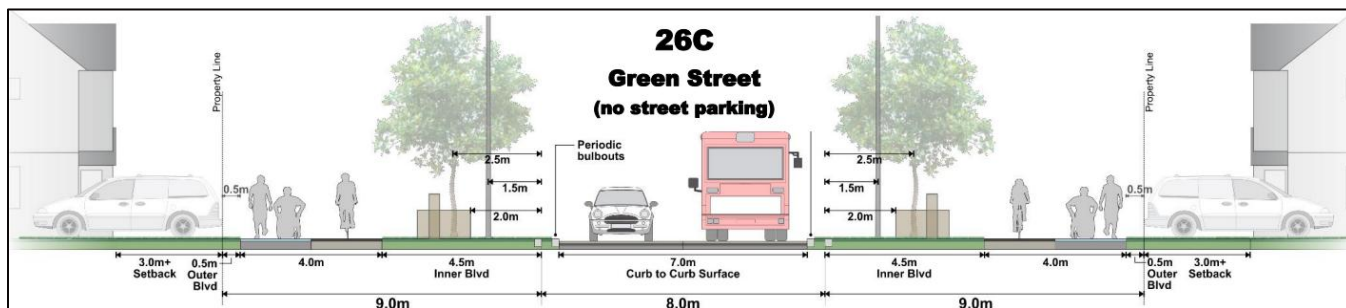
Proposed Kelly Farm Drive Cross-Section
